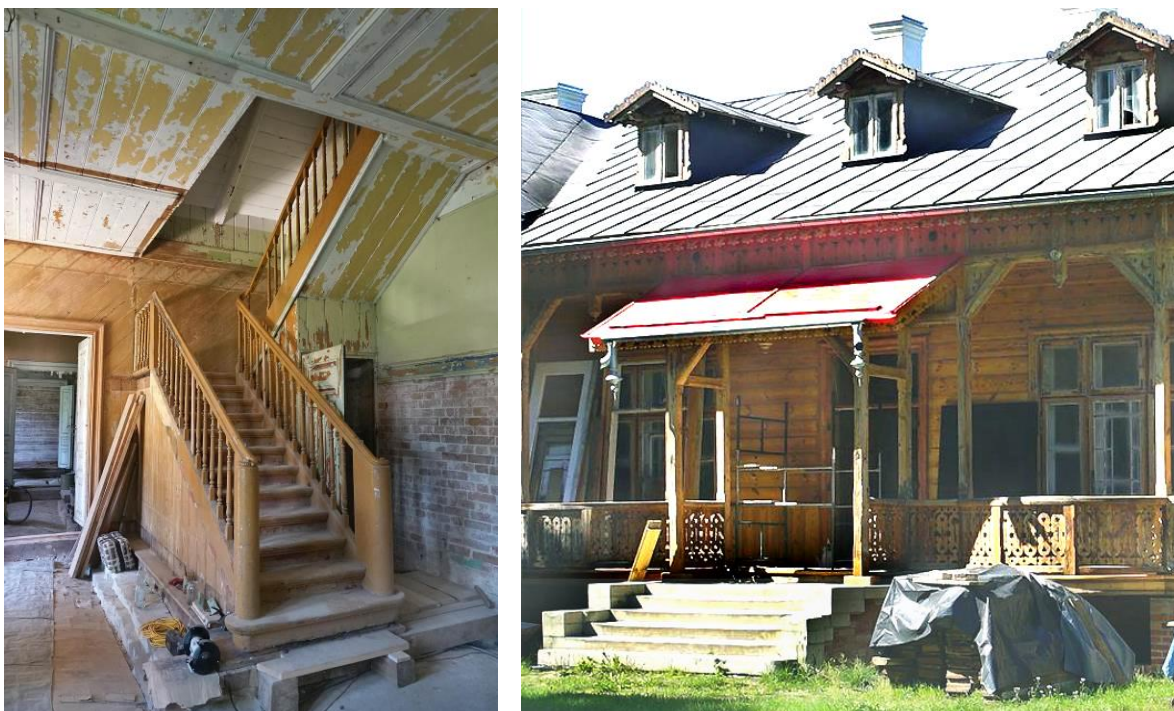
, 43. The Rzućów manor house – ground floor, internal wooden staircase to basement and first floor and original elements of the structure and decoration of the wooden entrance porch. Source: original photo 2023
